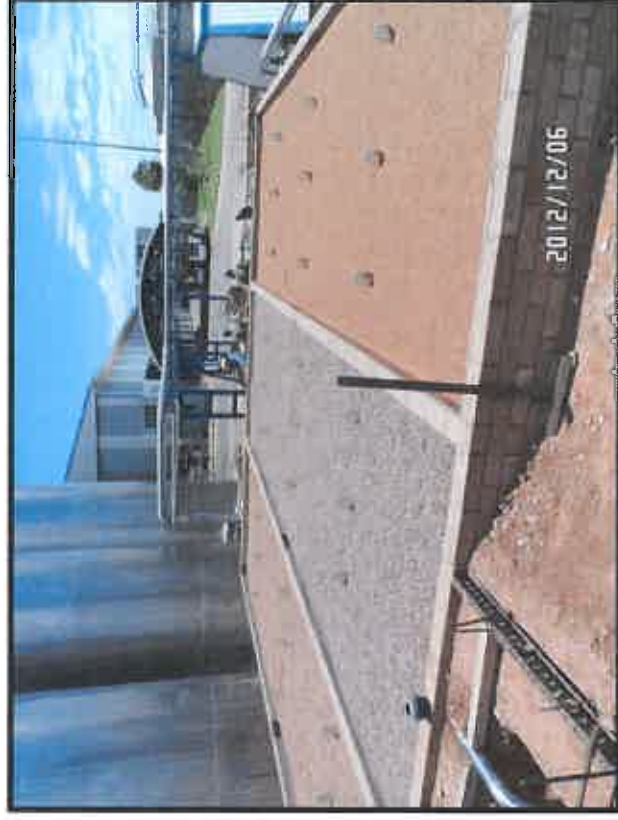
Taken from position 9, looking north-west over the proposed site for the oxidation ponds, and the area of pooling from the overflow from the existing pond system.
